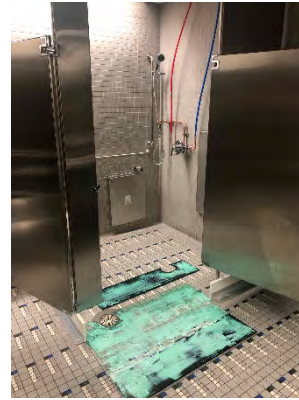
North Center Women's Restroom – ADA-Accessible Stall Converted to ADA Shower Stall
